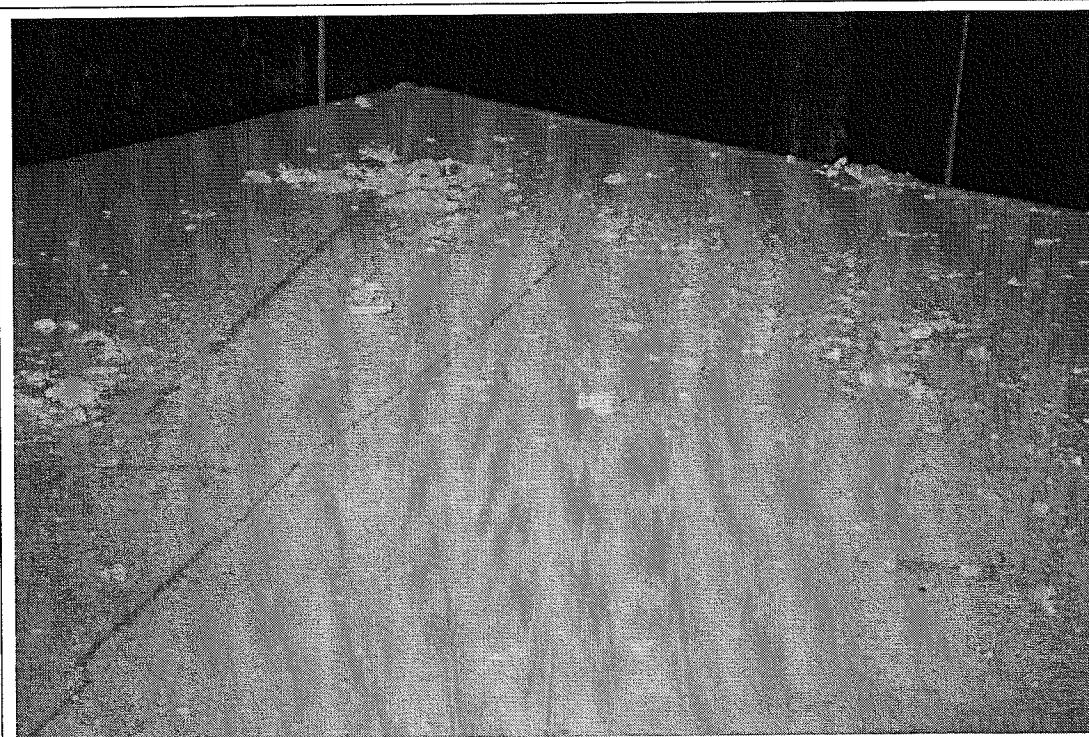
Close-up of delaminated fireproofing debris on top of HVAC duct in 5th floor attic
